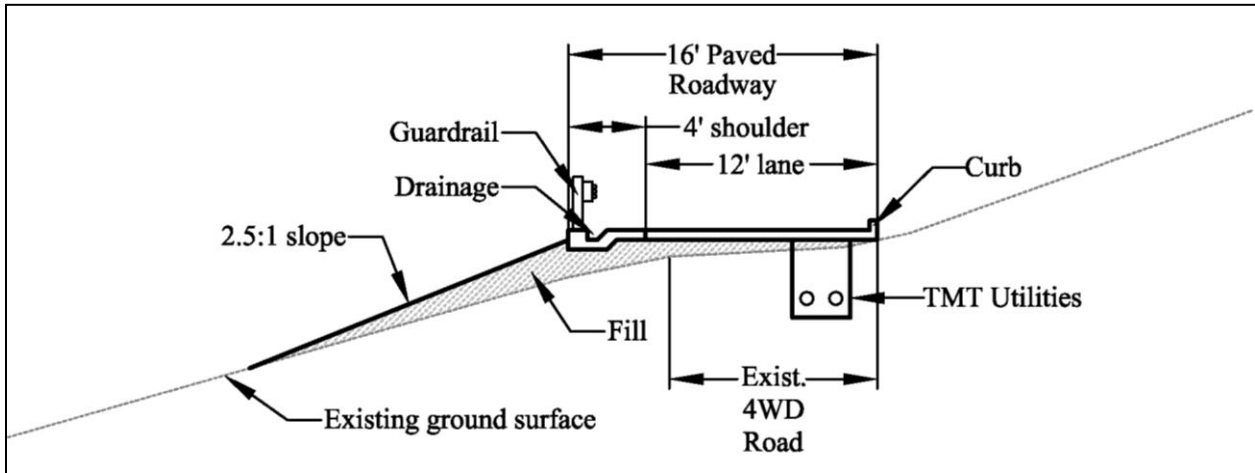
Cross Section of Access Way in Southernmost Cinder Section Overlapping 4-Wheel Drive Road
